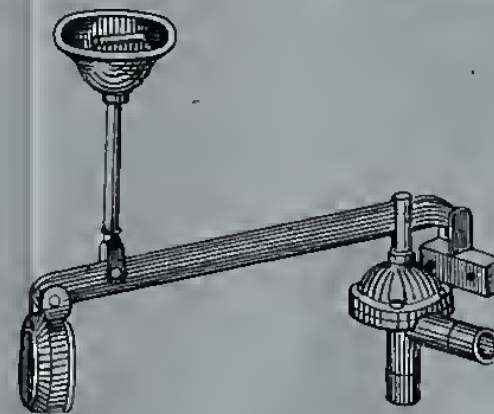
External view of arrangement with Valve in Fig. 319.
